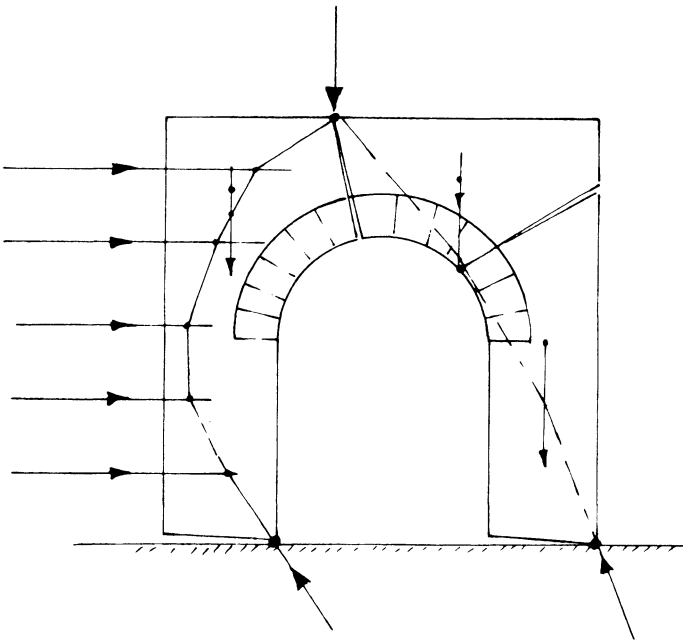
Line of thrust and failure mechanism in a building arch under vertical and horizontal loading
